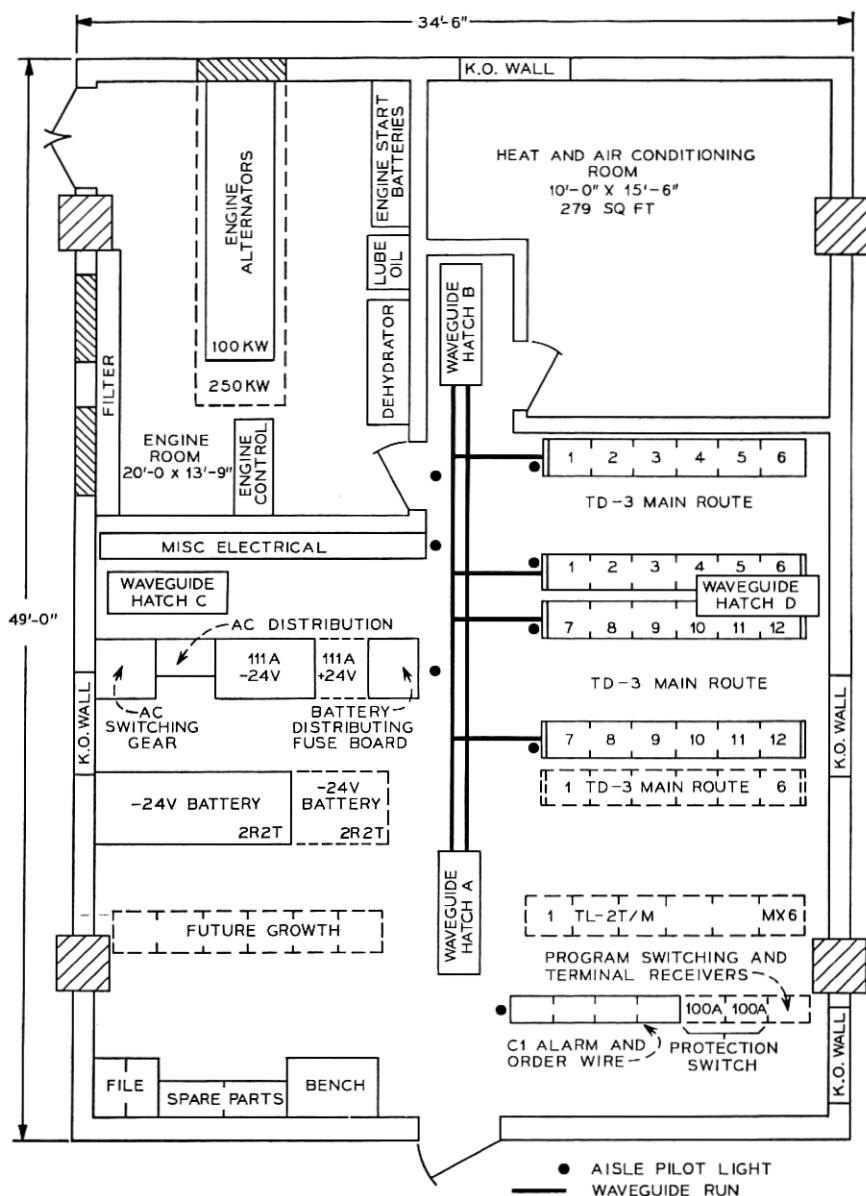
Floor plan of repeater stations on the initial TD-3 route.
